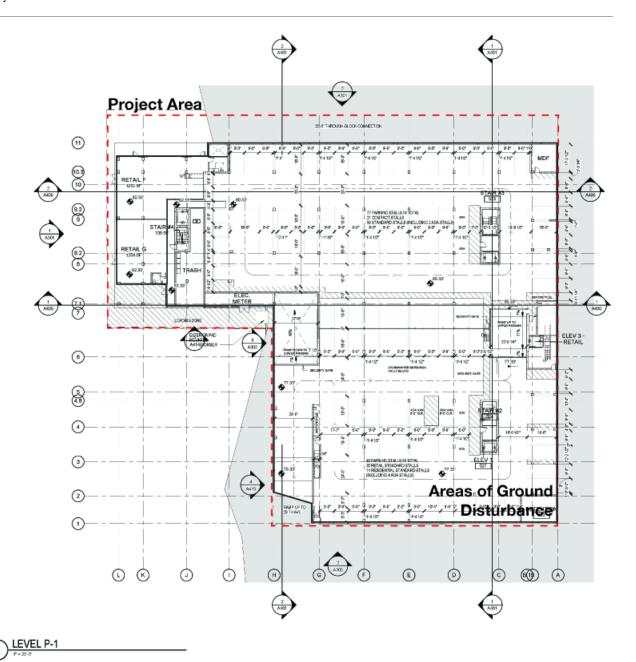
Areas of Proposed Ground Disturbance (black) and Project Area (red); building level P-1 (Source: Johnston Architects, LLC.)
